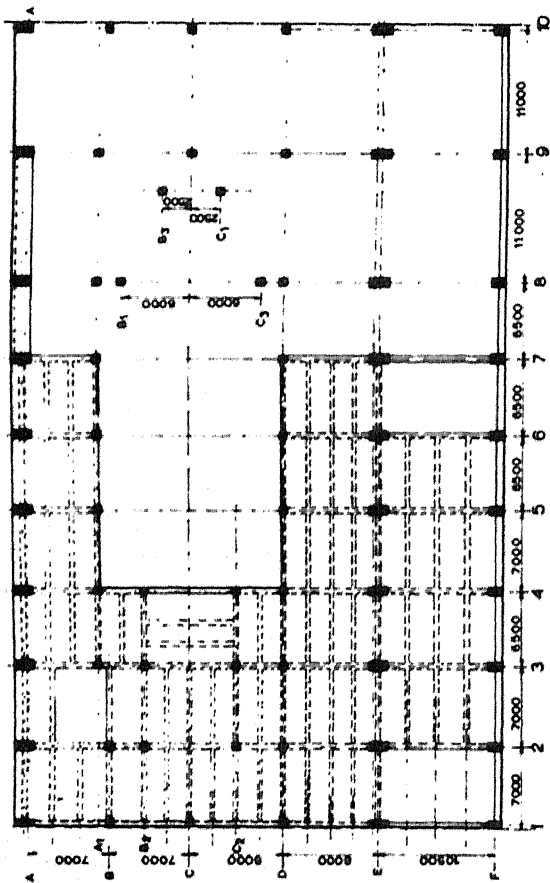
PLAN OF THE BUILDING AT EL. 100,000
